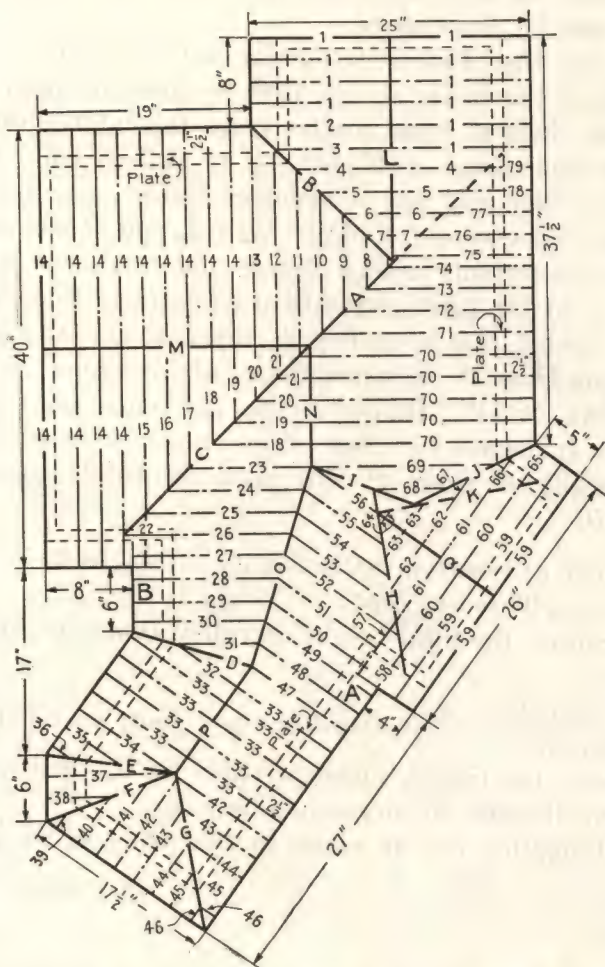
Plan of Problem 7, from Which the Working Layout Is Made
